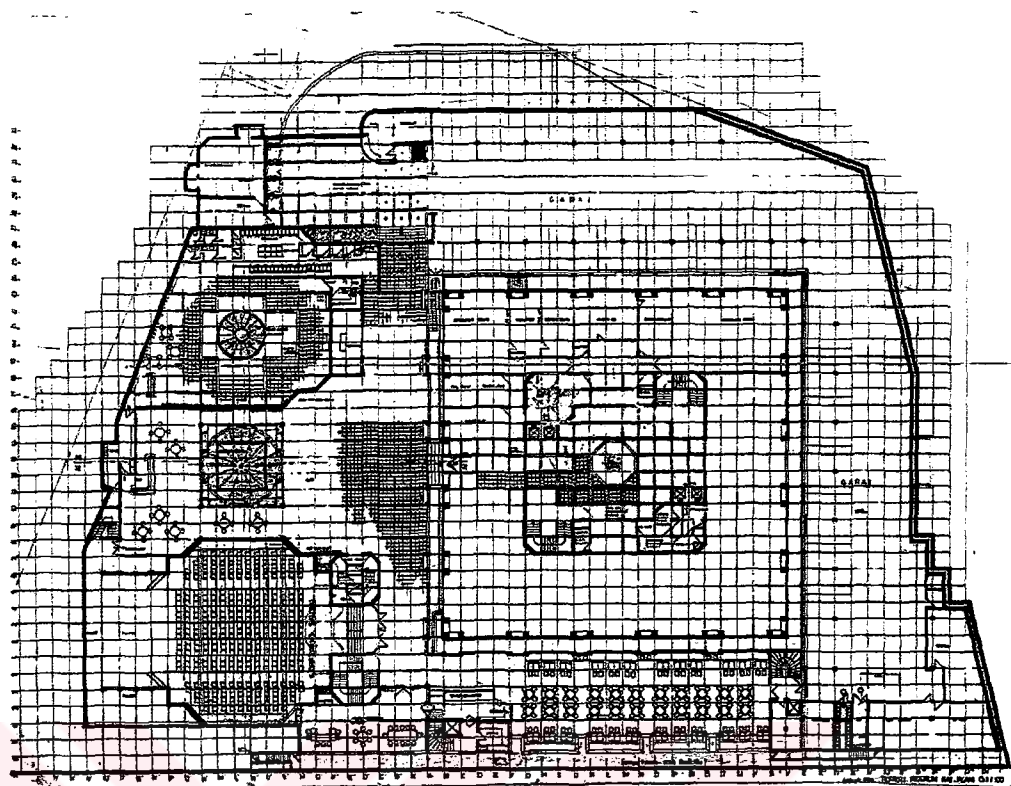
Şark Insurance Company Headquarters –first basement floor plan.
